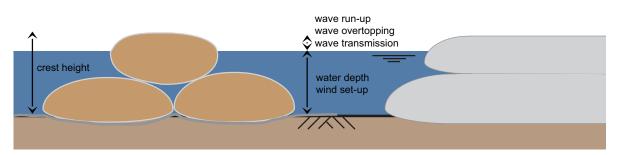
Cross-sectional View (left) and Side View (right) of Geotube Breakwater
